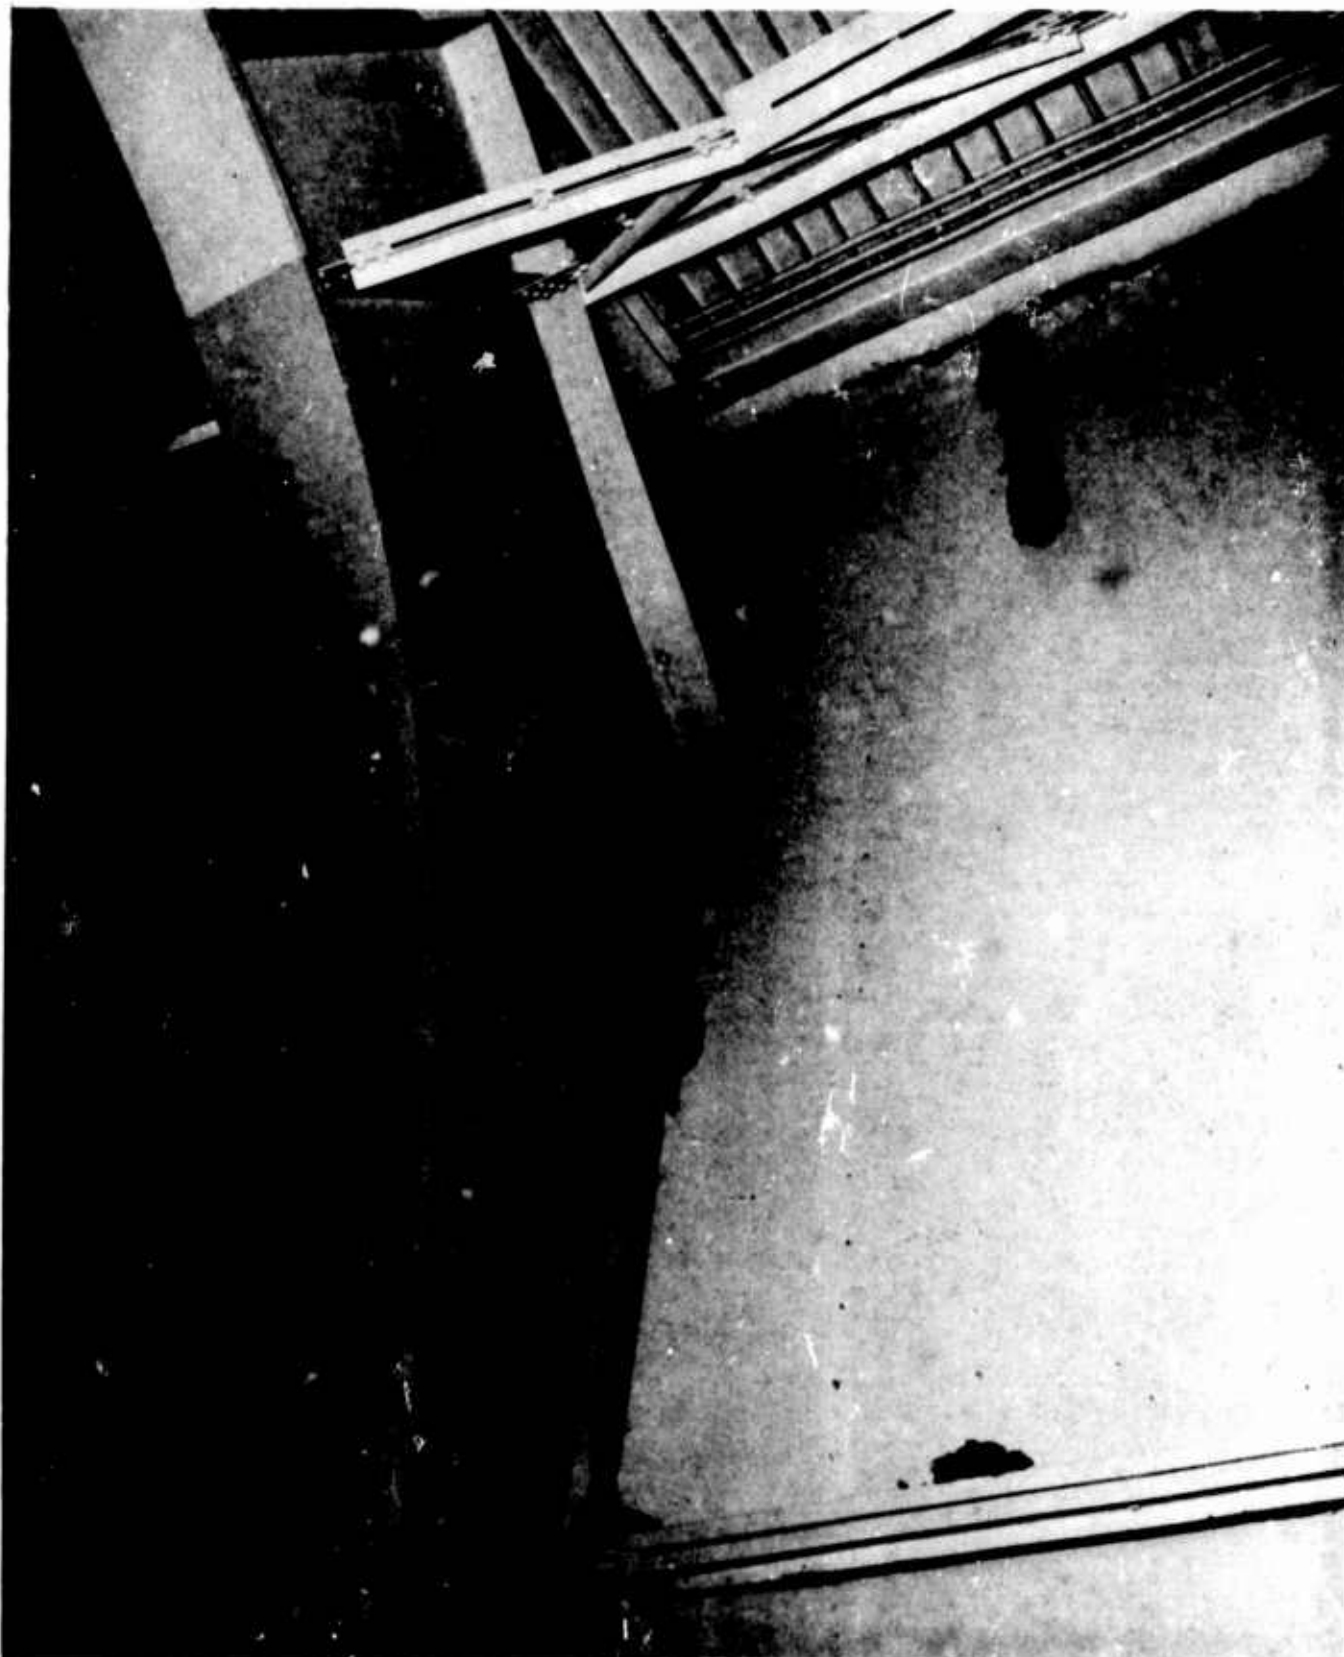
Elmendorf AFB Field House (Undamaged steel rigid frame inside gymnasium. Note indication of shock on plasterboard abutting frame.)
